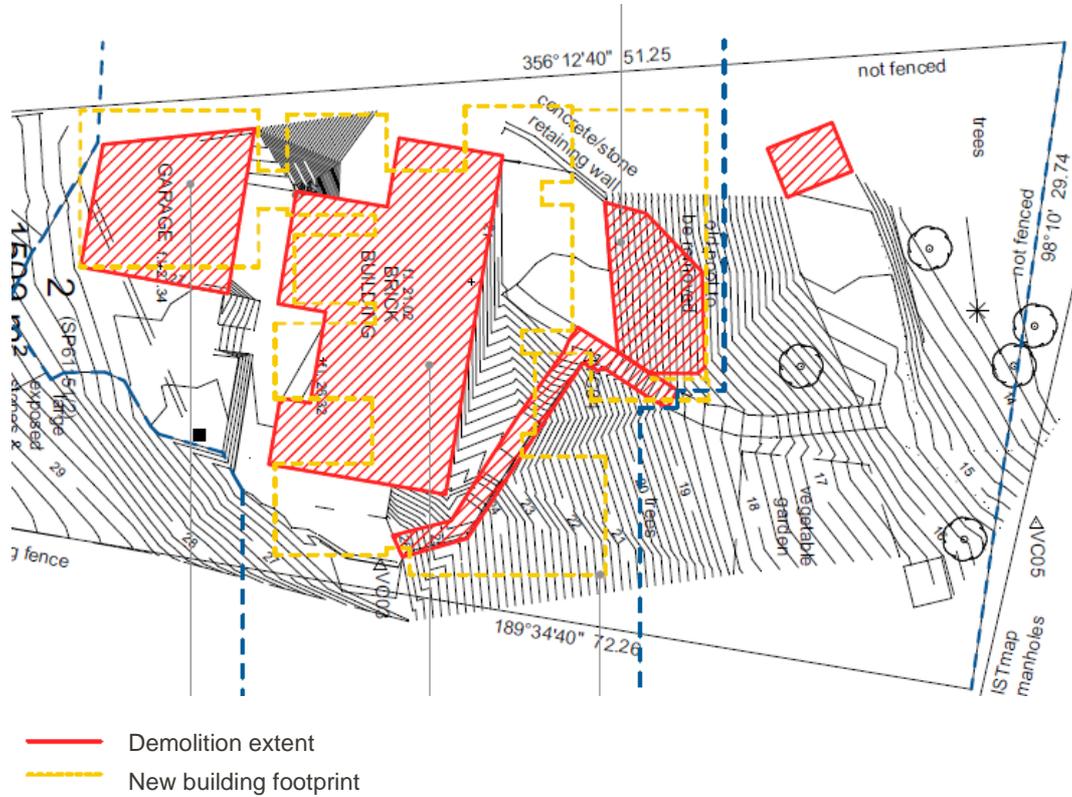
SITE PLAN SHOWING EXTENT OF EXISTING AND NEW DEVELOPMENT
